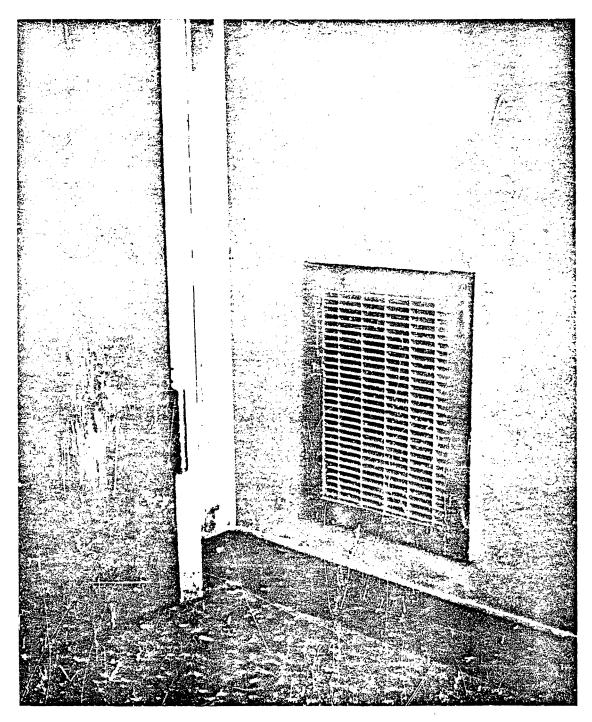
Photograph of the Floor Exhaust Grille in the Test Classroom
